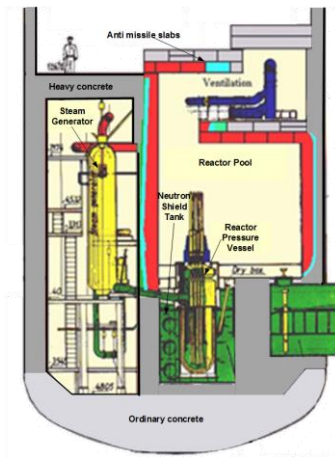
Cross section of the BR3 reactor building during exploitation showing the main components. The building structure is mainly composed of reinforced ordinary concrete (bottom plate) and reinforced heavy concrete (upper structure). The activated concrete is marked in red colour (first rough estimation).
